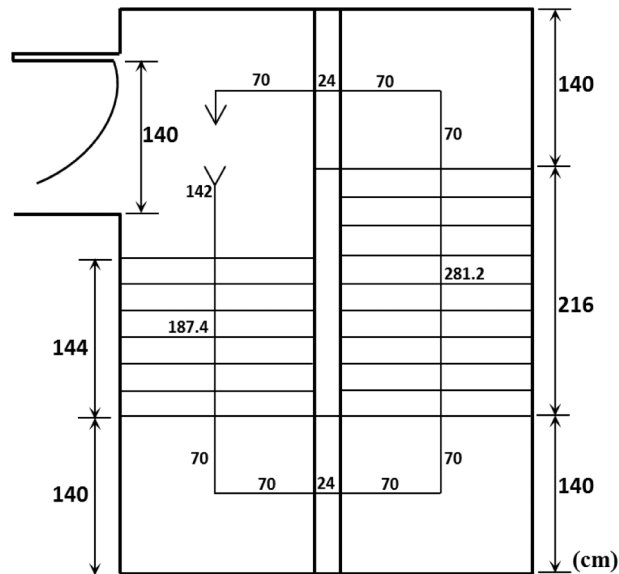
Dimension of building stairs, Taipei 101 stair section on the 7th–91st floor.
